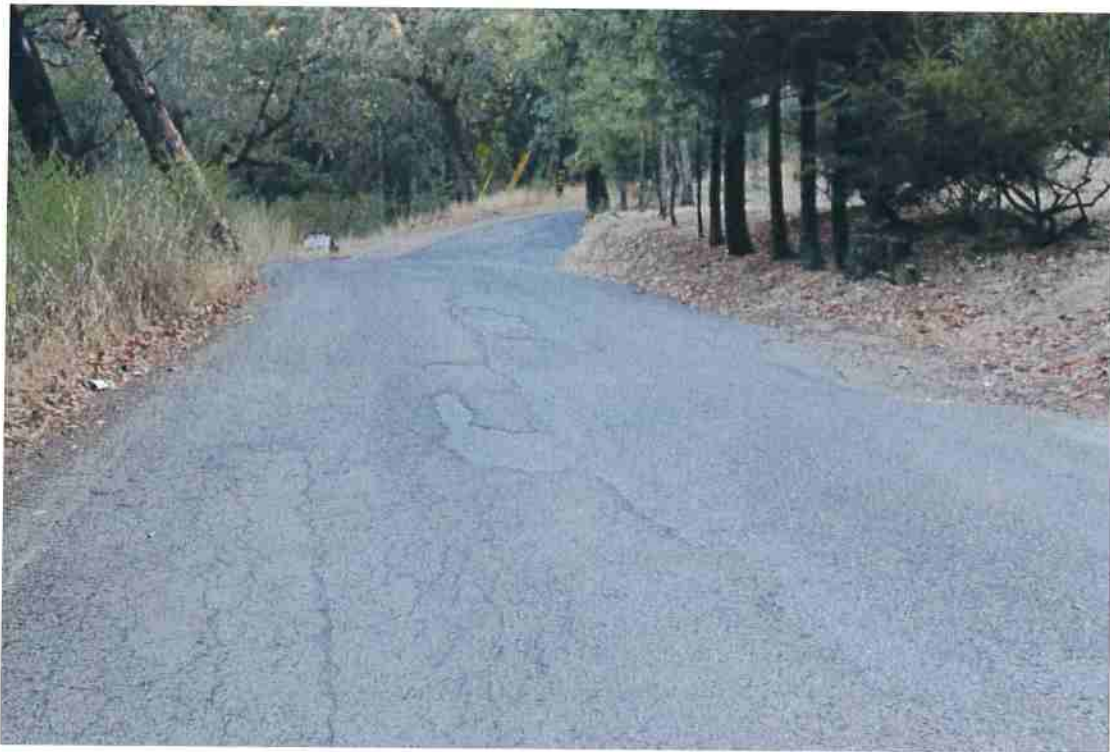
Mile 0.4: 18-ft road width with 1-ft shoulders.
